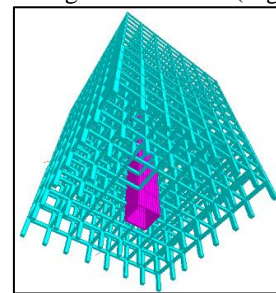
Floating column at 2nd intermediate position of columns and shear wall at center of the building
